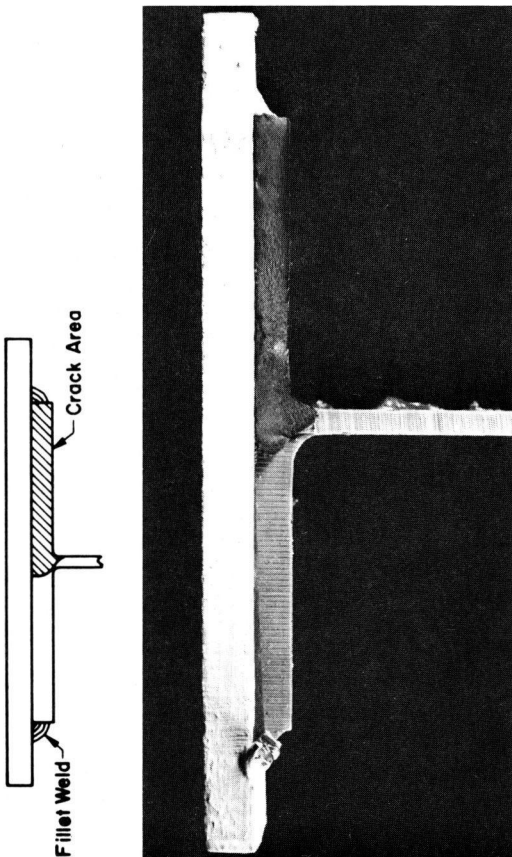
Crack growth at unwelded end of cover plates wider than the beam flange.
